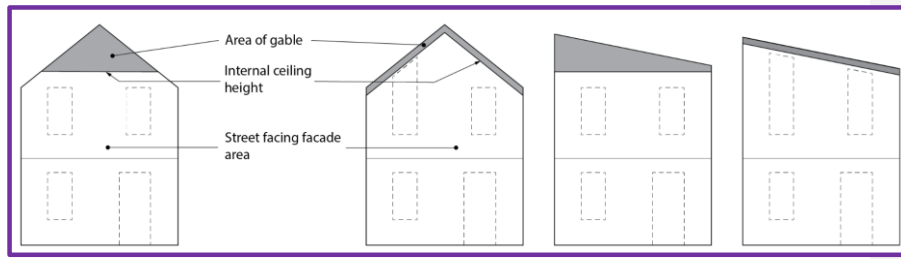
How to measure street facing gable Example of different buildings with front gables excluded from calculation
